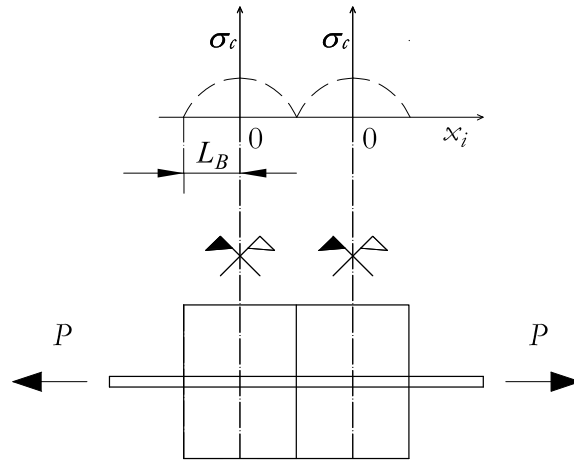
Representative concrete block at minimum crack spacing configuration
